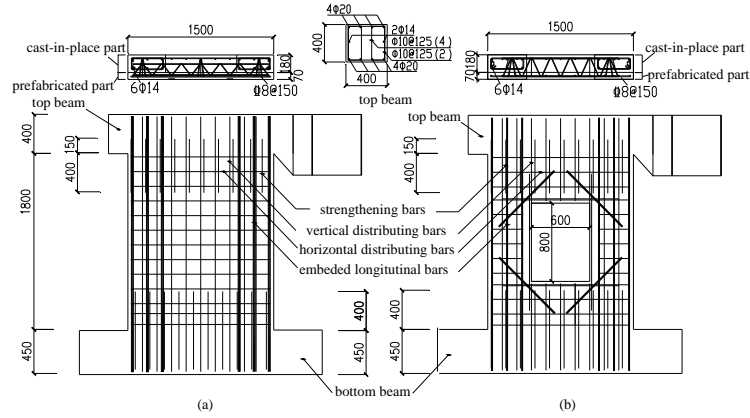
Details of the specimen (unit: mm) — (a) PCFA; (b) PCFB
